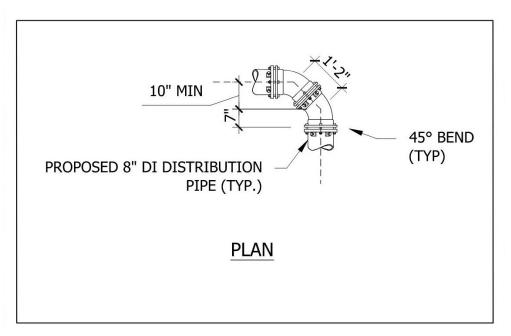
Typical 90° Degree Horizontal Bend - 8" DI Pipe
